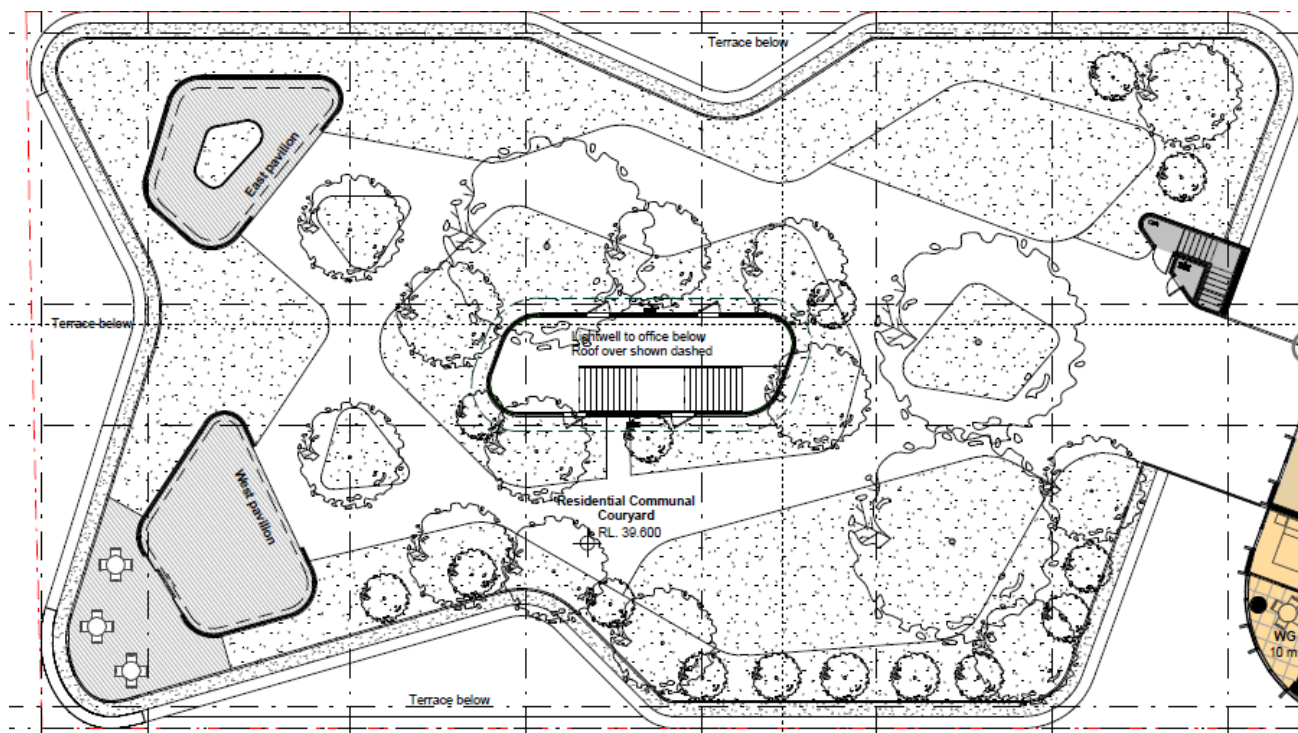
Approved location of the eastern pavilion on the roof of level 09
